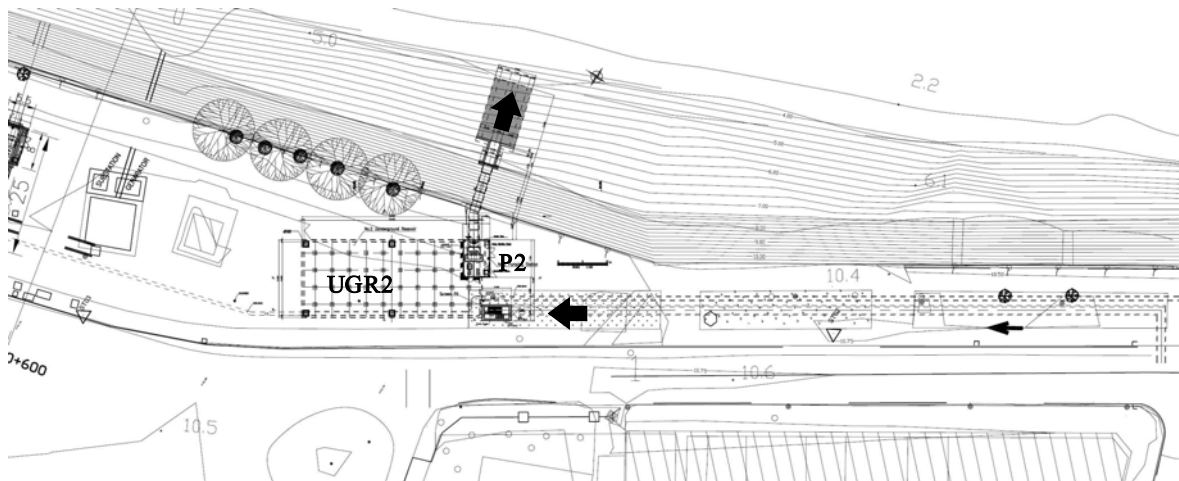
Layout of Underground Reservoir No. 2 and Pumping Station No. 2
